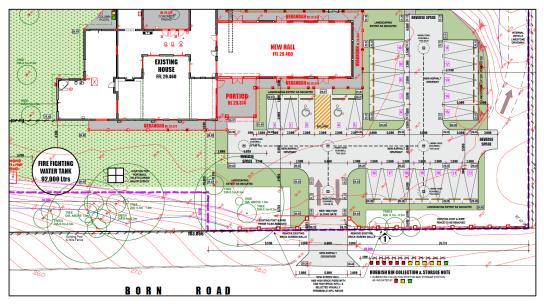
Key Dimensions of the Proposed Formal Parking Area
